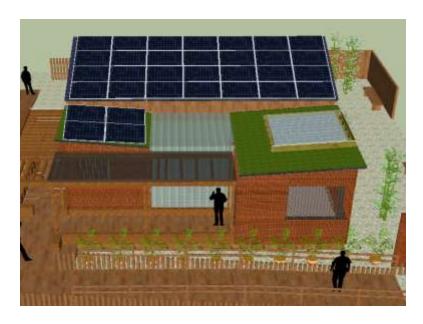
Placement of Solar Hot Water Collectors on Funnel Roof Design.
